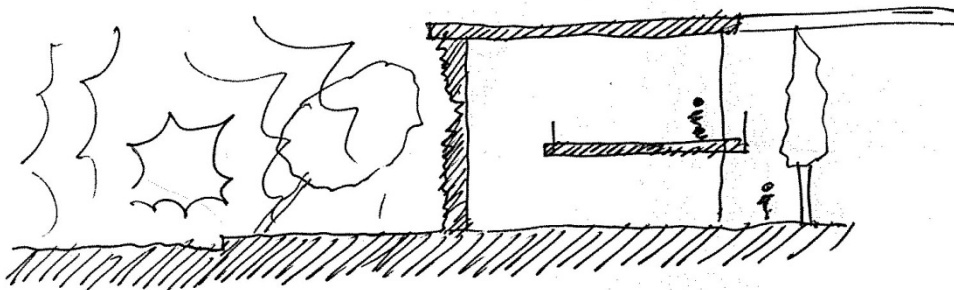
Exterior blast prevented from infiltrating building. Image by author.
